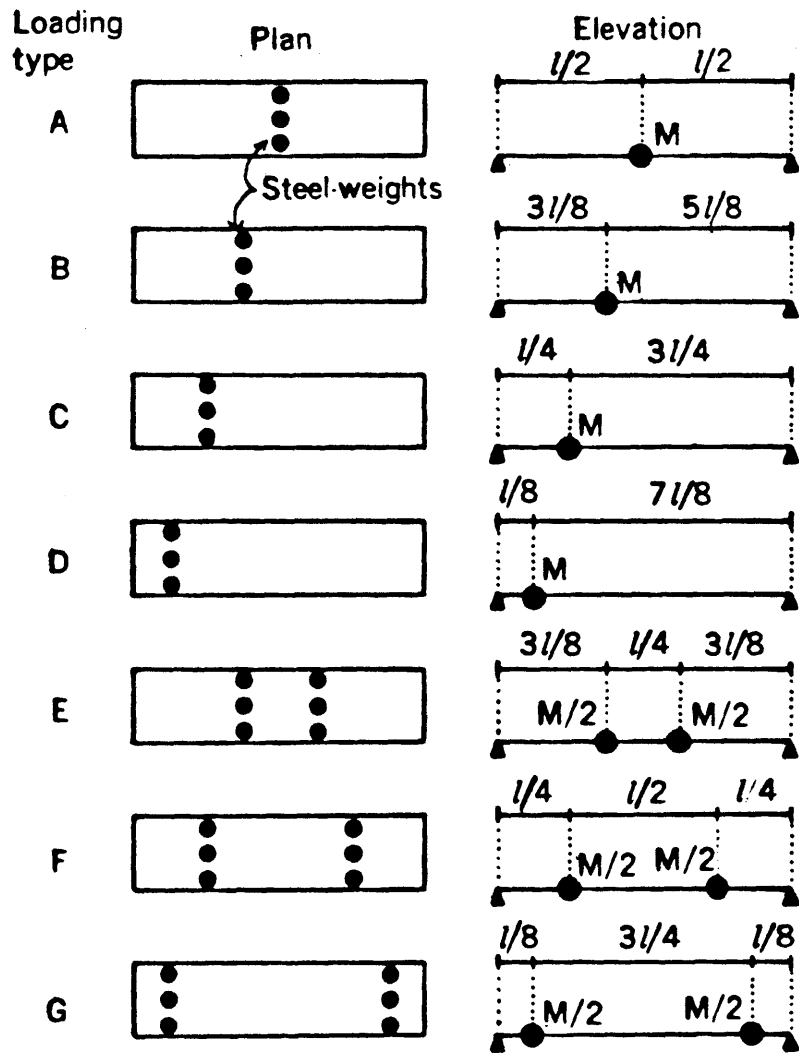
3 Loading types of steel-weights placed on the tested panel.
